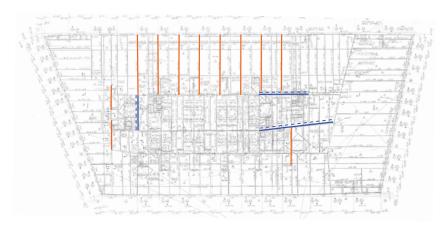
Transfer trusses (blue) and Transfer girders (orange) at Floor 7
